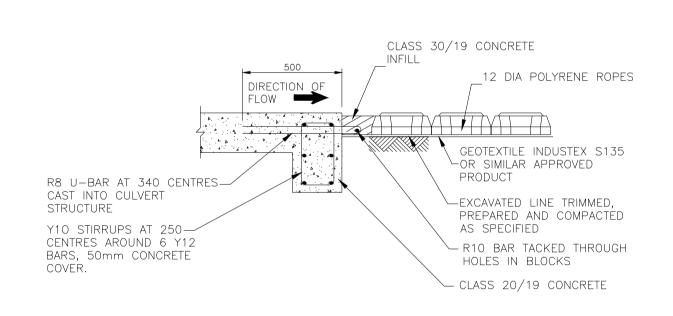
DETAIL FOR CONNECTION TO CULVERT DETAIL FOR CONNECTION TO OUTLET STRUCTURE ANCHOR BEAM
